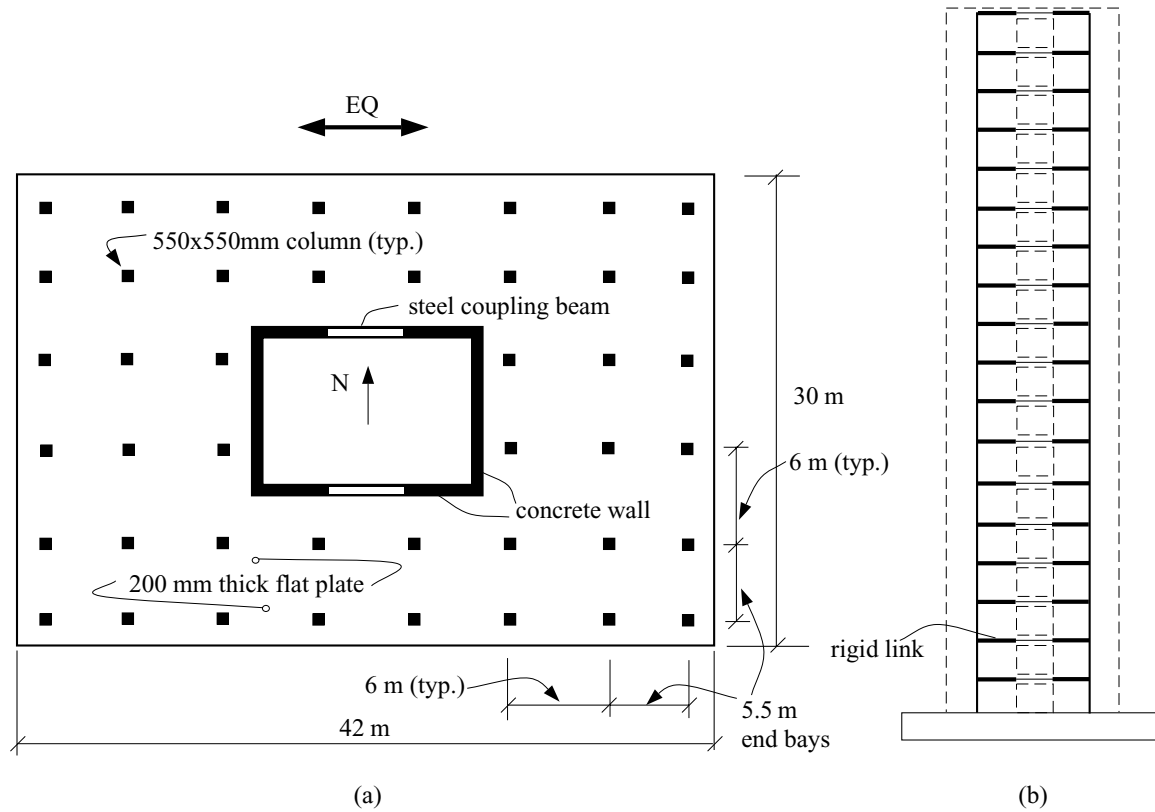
Hybrid coupled wall system with embedded steel beams (adapted from Harries 1996): (a) plan view; (b) analytical model
